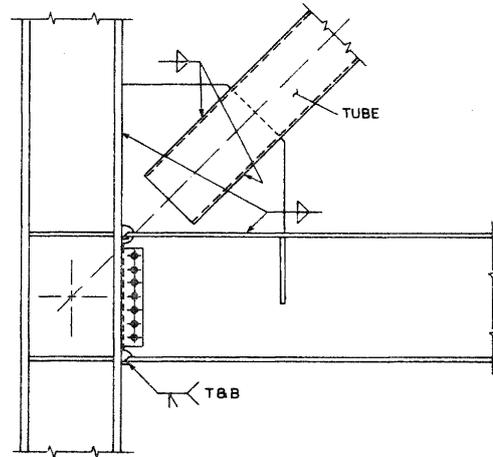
TYPICAL DETAIL FOR BRACE AT MOMENT BEAM-COLUMN CONNECTION
